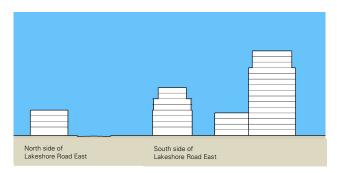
Development in the Lakeview Waterfront along Lakeshore Road East with an 8 storey building and a 15 storey building behind.
